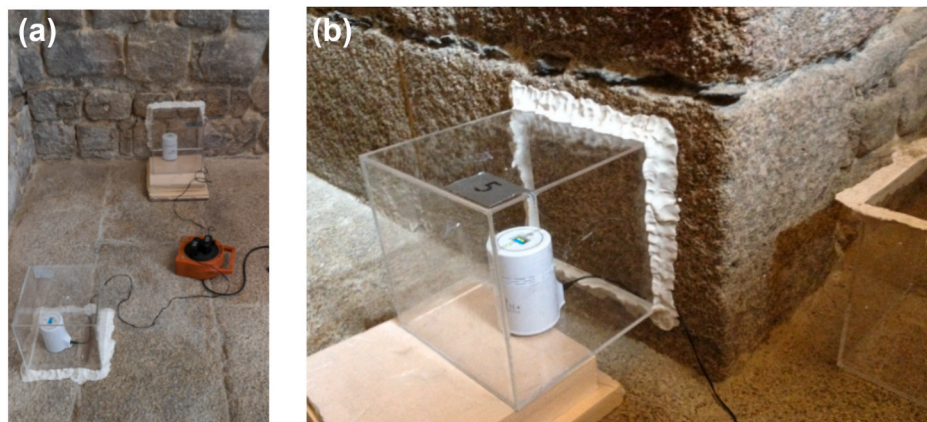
Examples of test setups in the Tower of Hercules: a) *opus vittatum* wall with a joint; b) *opus quadratum* wall with no joint.
